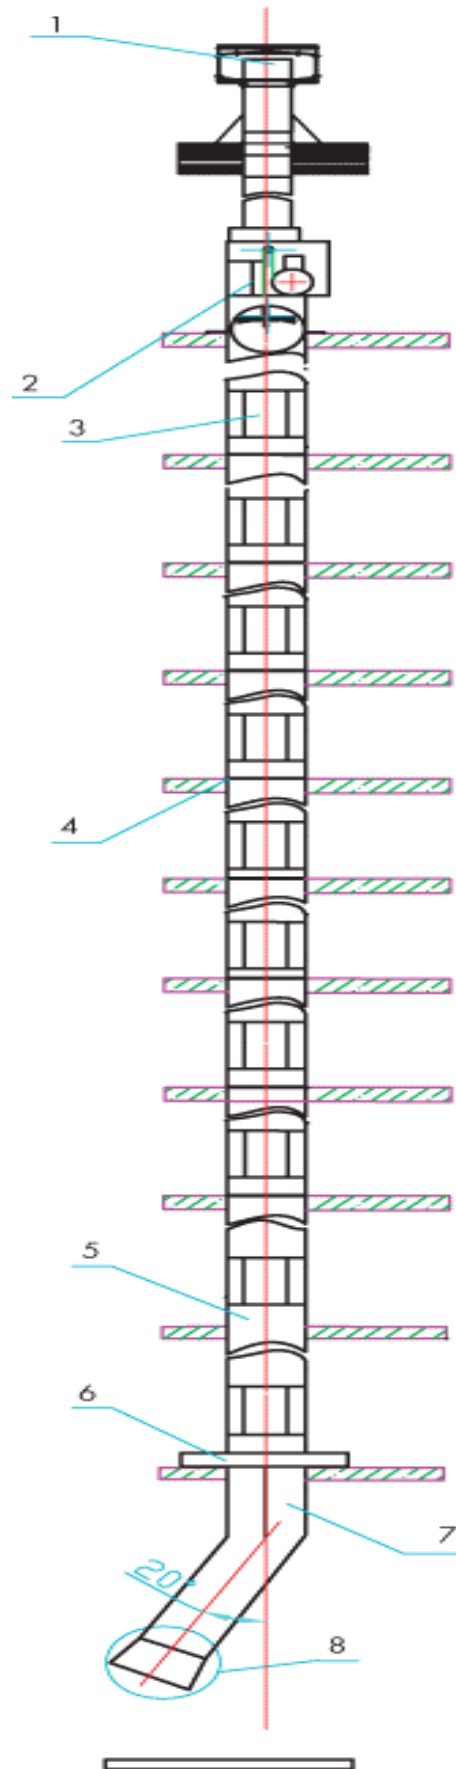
Scheme of the refuse chute: 1) ventilation system; 2) cleaning disinfection unit; 3) loading valve; 4) support-loading clamp; 5) shaft; 6) shaft support; 7) branch pipe of the gate valve; 8) gate valve.
